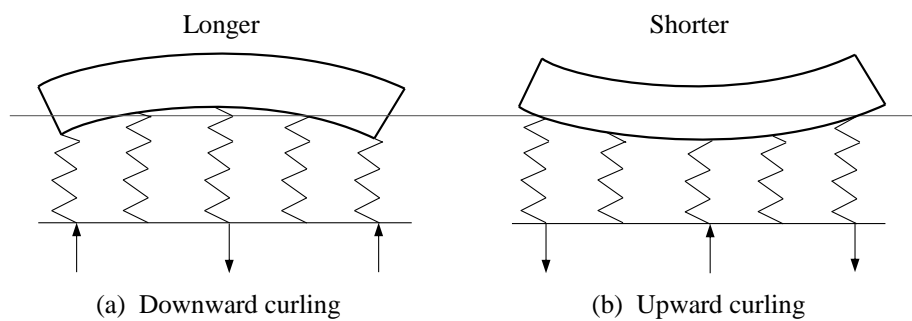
Curling of concrete pavement structures (Huang, 2004)
